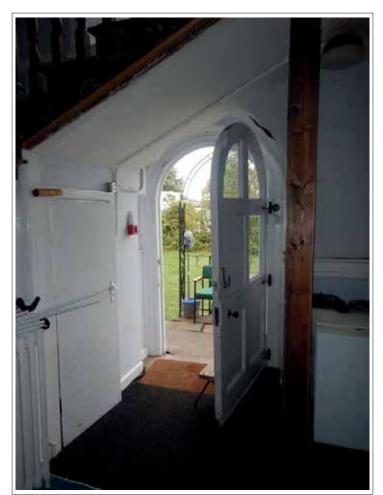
Rear door to Mulberry House in Room 0.1, looking north-east.
